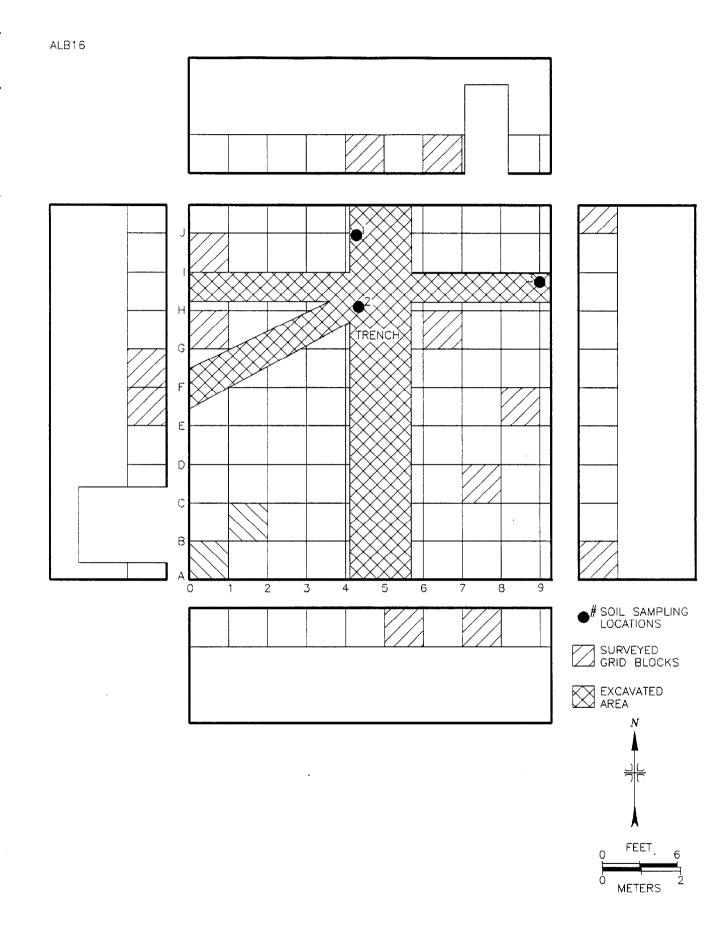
Layout of Room 1, Building 31, Indicating Soil Sampling and Measurement Locations
